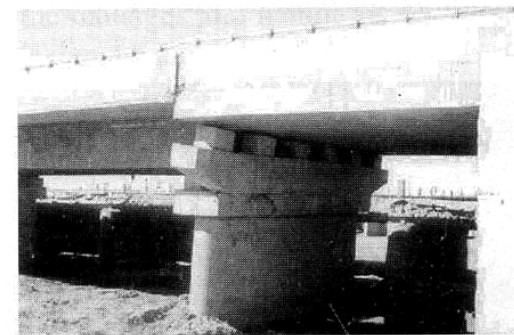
Damage to the unequal-height bed blocks at the RC bridge near Vondh. The pier supports two spans with different girder/slab depths.
